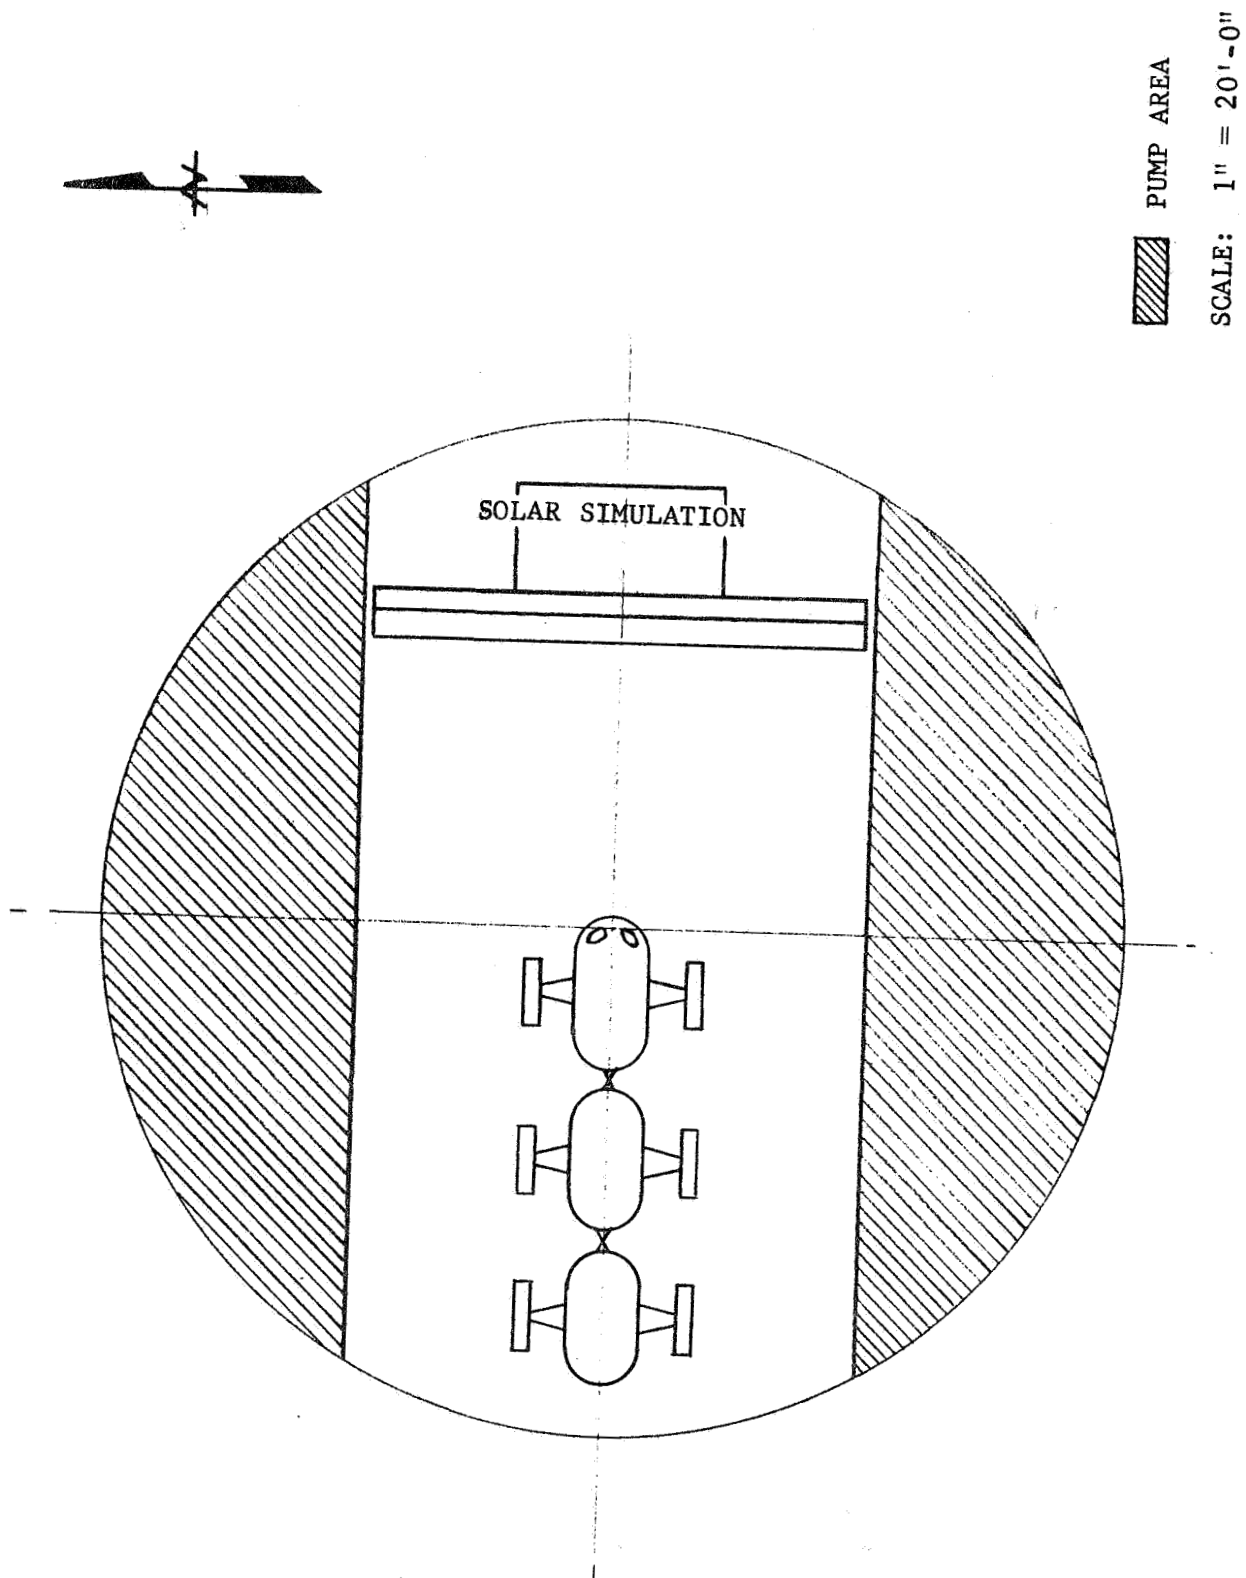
SPACE PROPULSION FACILITY WORKING ENVELOPE
